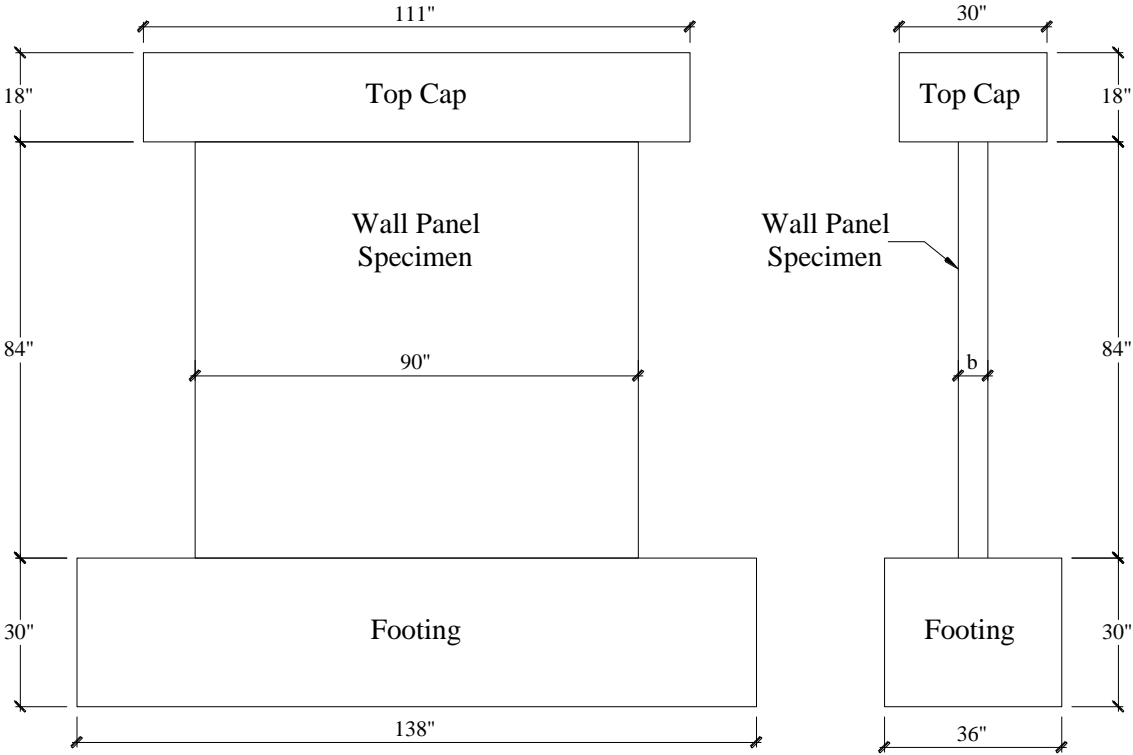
Test specimen elevations (Conversion: 1”=25.4mm)
